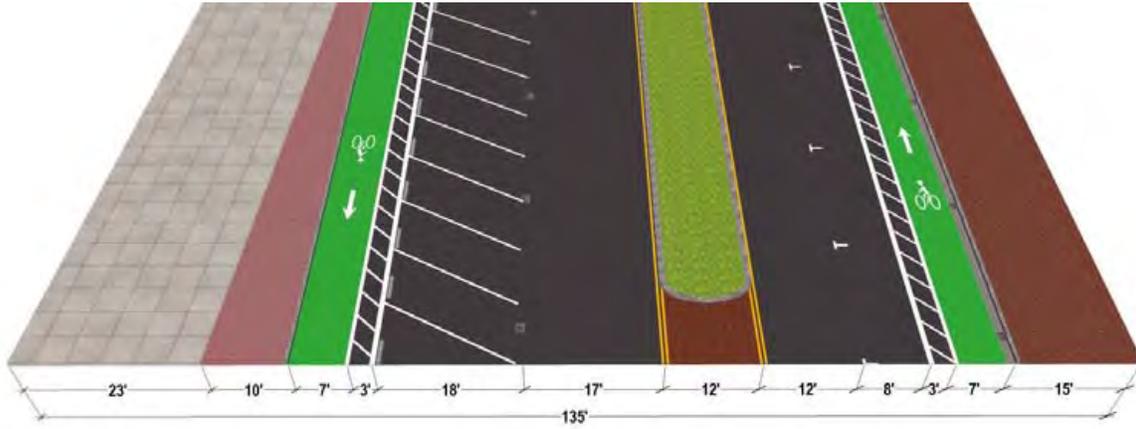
Alternative Concept #3 – Back-in Angled Parking near Town Hall
